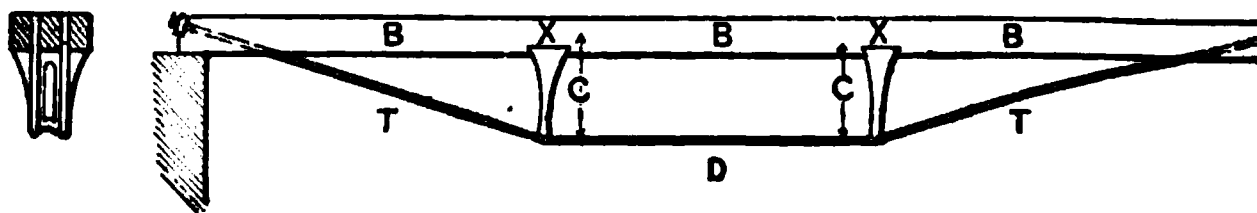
Trussed Wooden Girder. Two Vertical Struts
